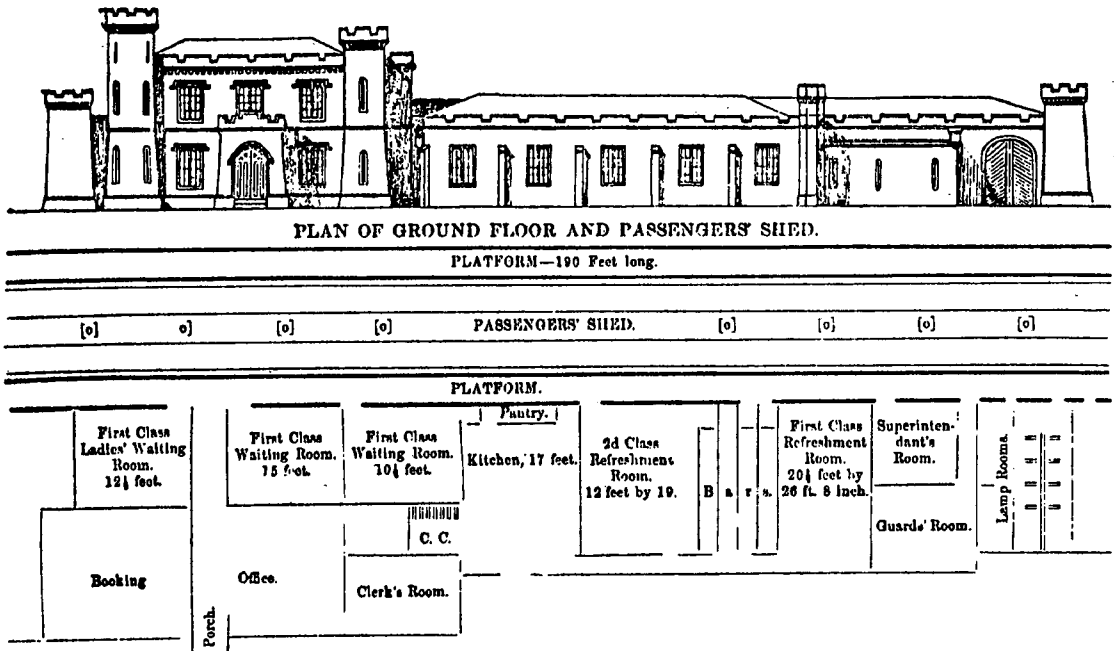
Plan and elevation of the Berwick Terminus from the Berwick Advertiser (1846)
